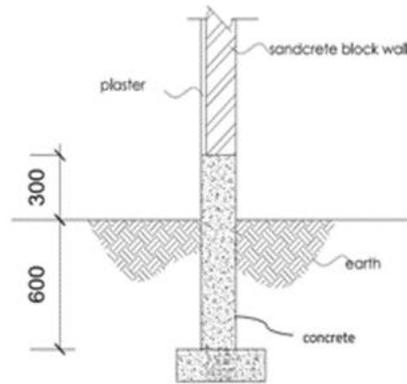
Creation of a barrier against capillary flux (Test Wall 7)
